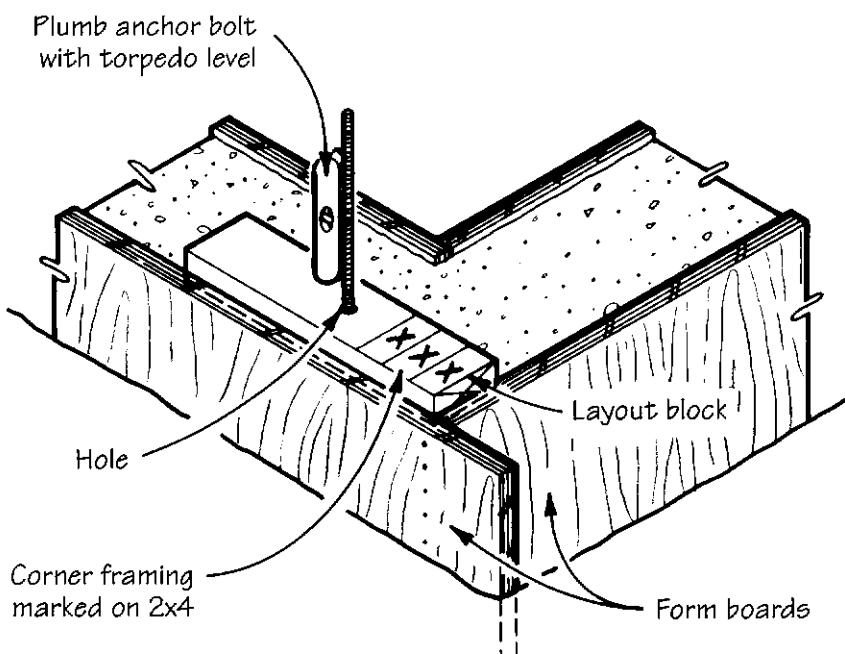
To ensure the exact position of a corner anchor bolt, the author uses a layout block with a hole to hold the anchor bolt in the foundation form. The block is also useful for hold-downs at door and window openings.
